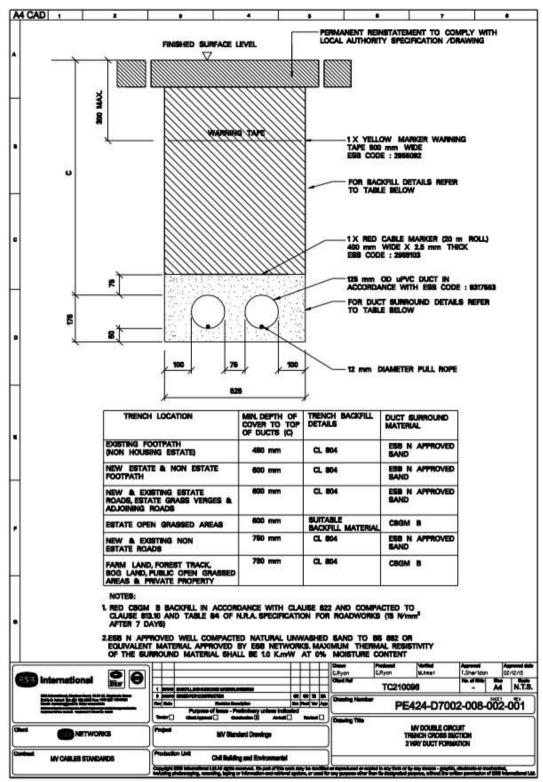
Typical Cross Section of Trench for Underground Cable (Source: ESBN, May 2019)
